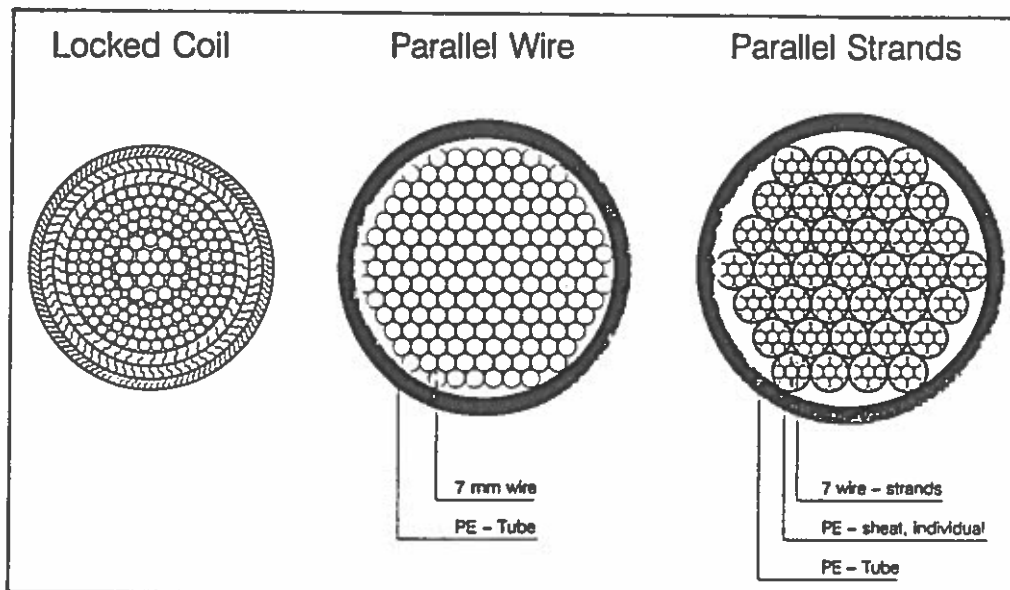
Stay Cable Alternatives for Cablestayed Bridges with 900 m Main Span
